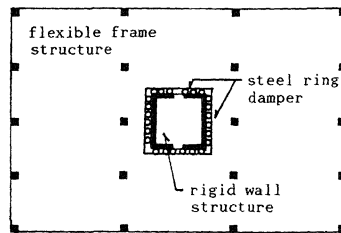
Example of SDS plan and arrangement of steel ring dampers
